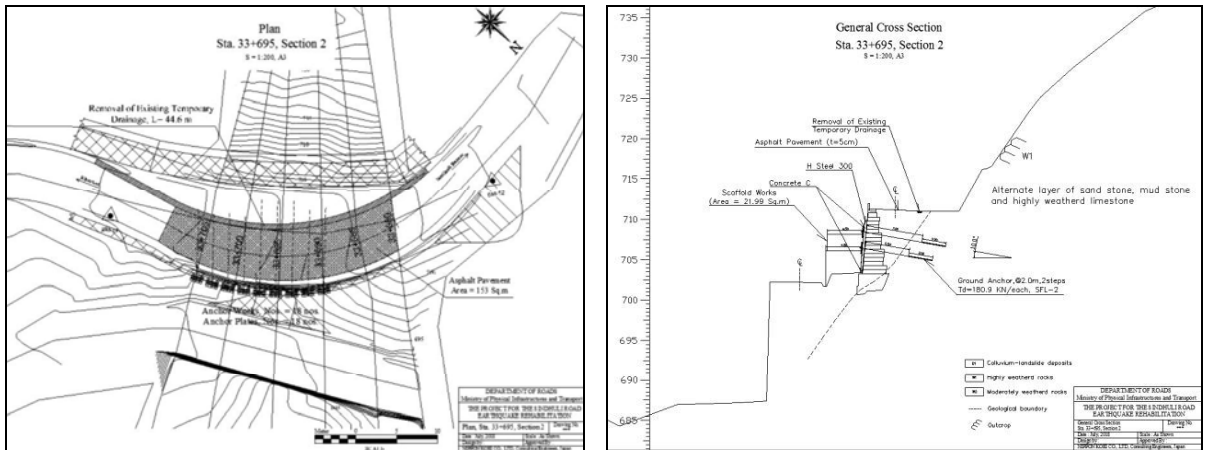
General Plan and Cross Section of the Proposed Countermeasures (Sta. 33+695)
